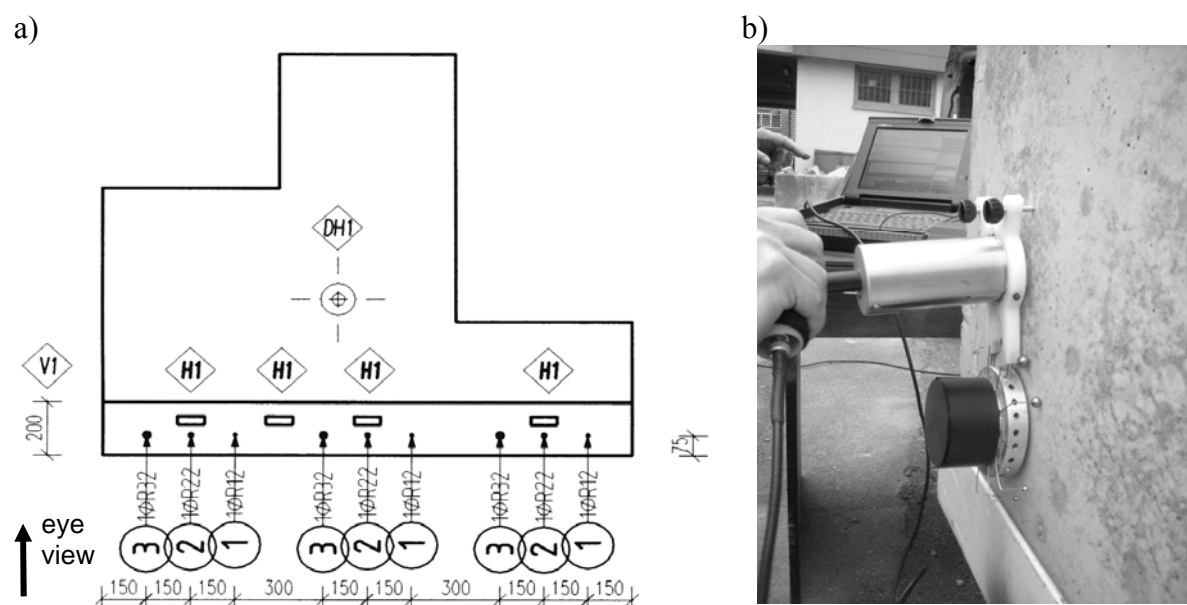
Schematic layout of the concrete block with artificial defects a) side view of the front wall measuring by DOCTer I-E system b)
